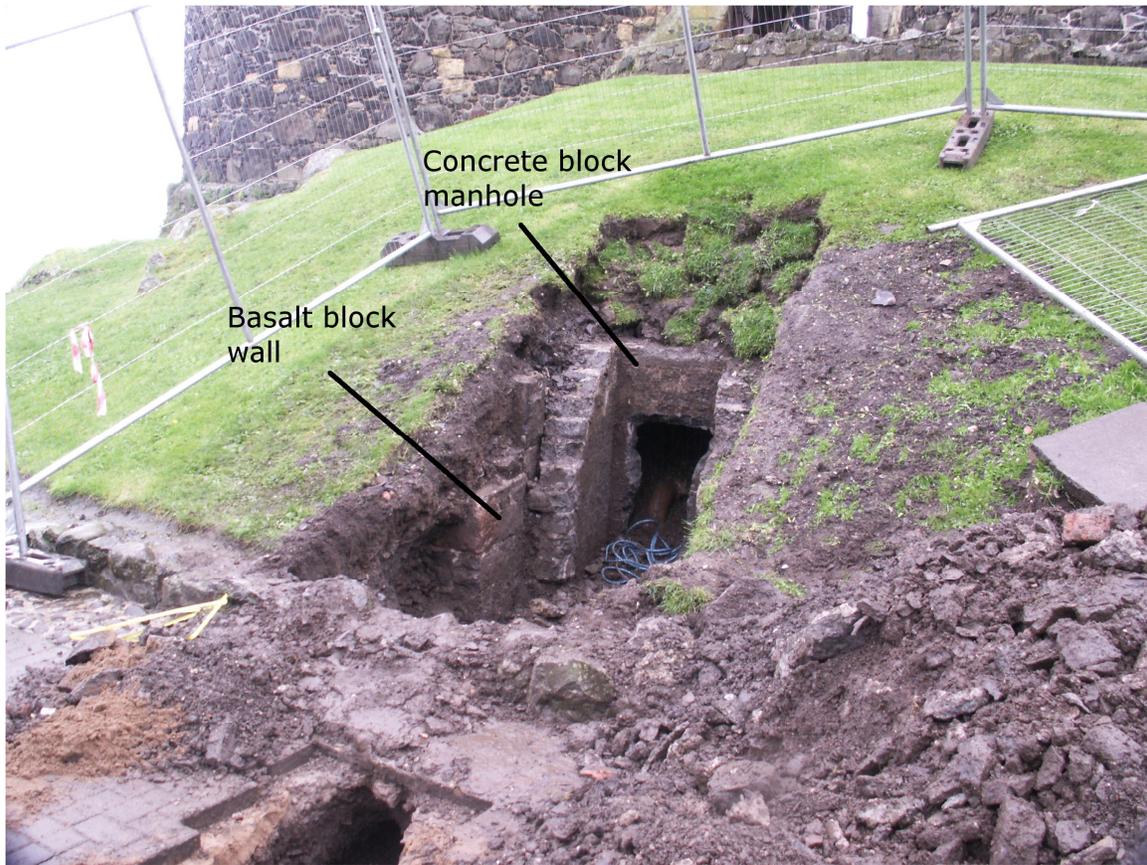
Trench 2 from the northwest showing concrete block manhole wall (6) and basalt block wall (5).
